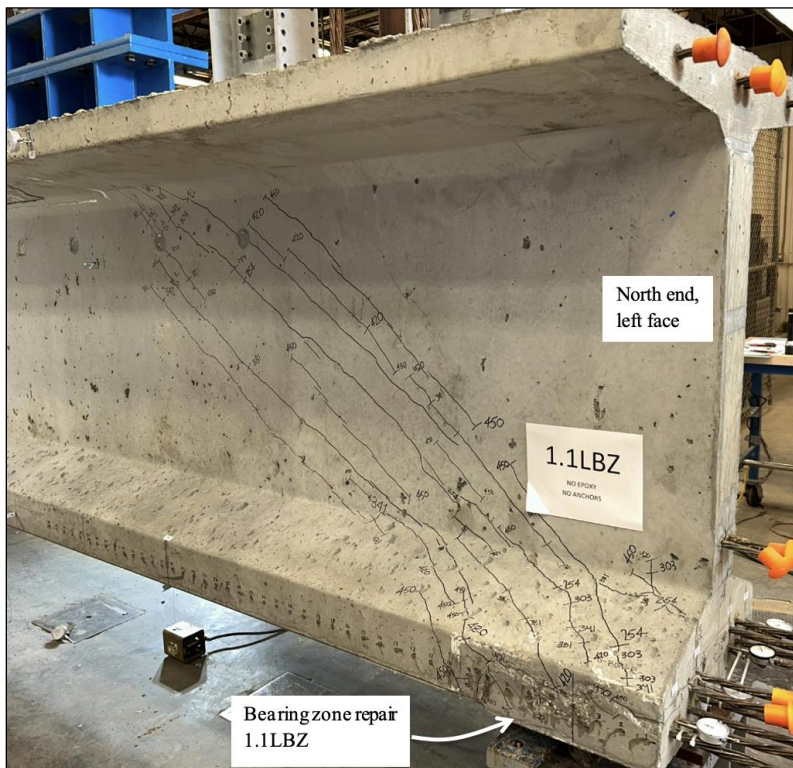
Photo. Test 1.1.S (repair 1.1LBZ) overall crack pattern on repaired girder side at 450 kip (left face of girder pictured).
